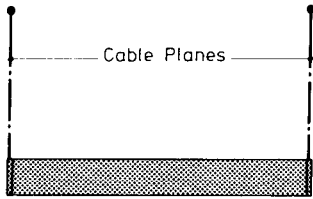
System with two vertical cable planes positioned outside the bridge deck
